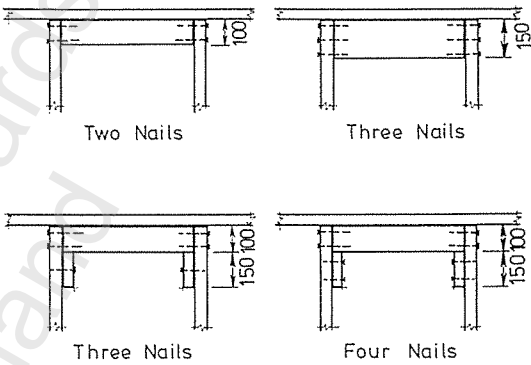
Top plates of loadbearing walls with supporting dwang on edge (see table 18 and fig. 45C)
